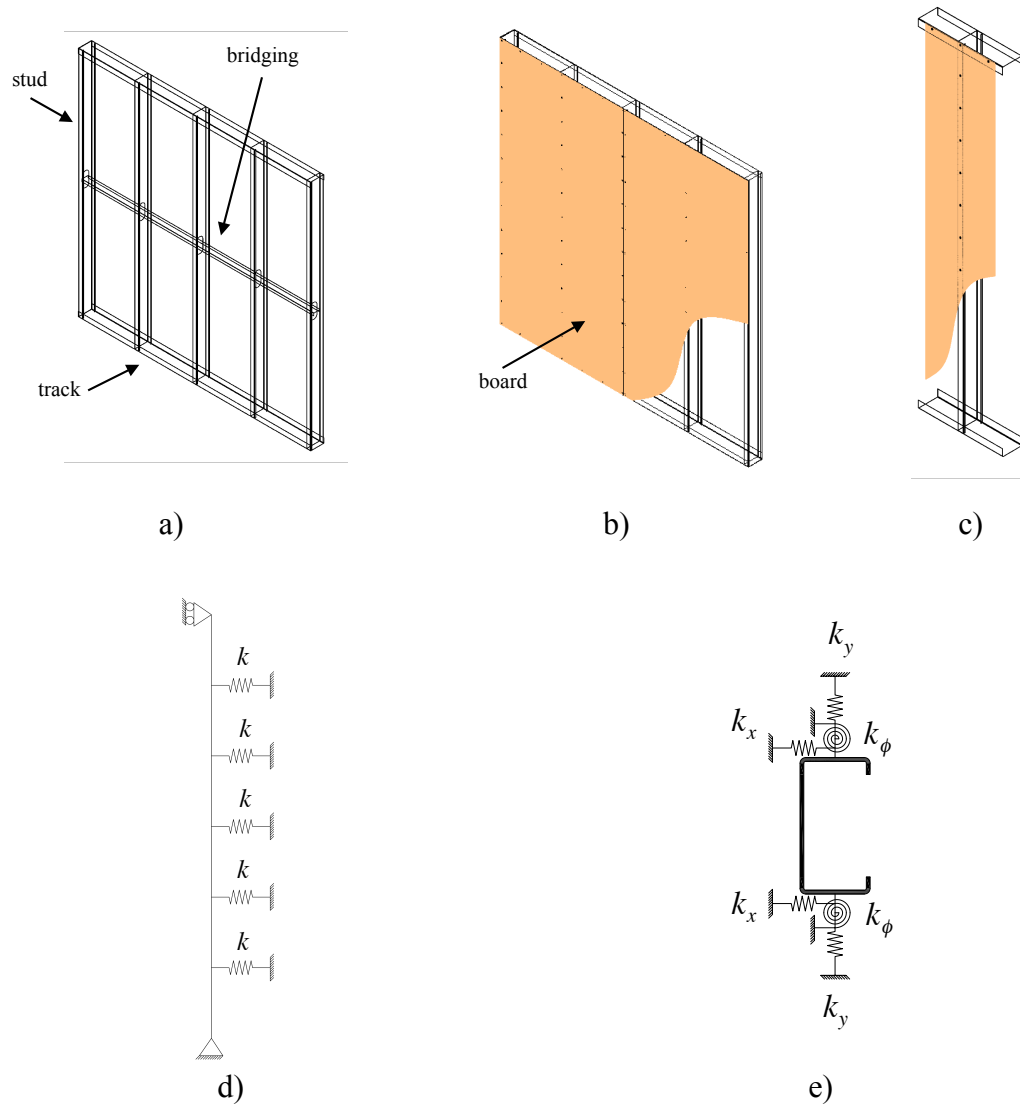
Cold-formed steel walls and bracing of the studs. a) All-steel design with studs braced by bridging, b) Sheathed wall design with stud braced only by sheathing, c) Isolated single column with sheathing, d) Schematic model of stud bracing by sheathing, e) Detailed model of bracing springs applied to the cross-section.
